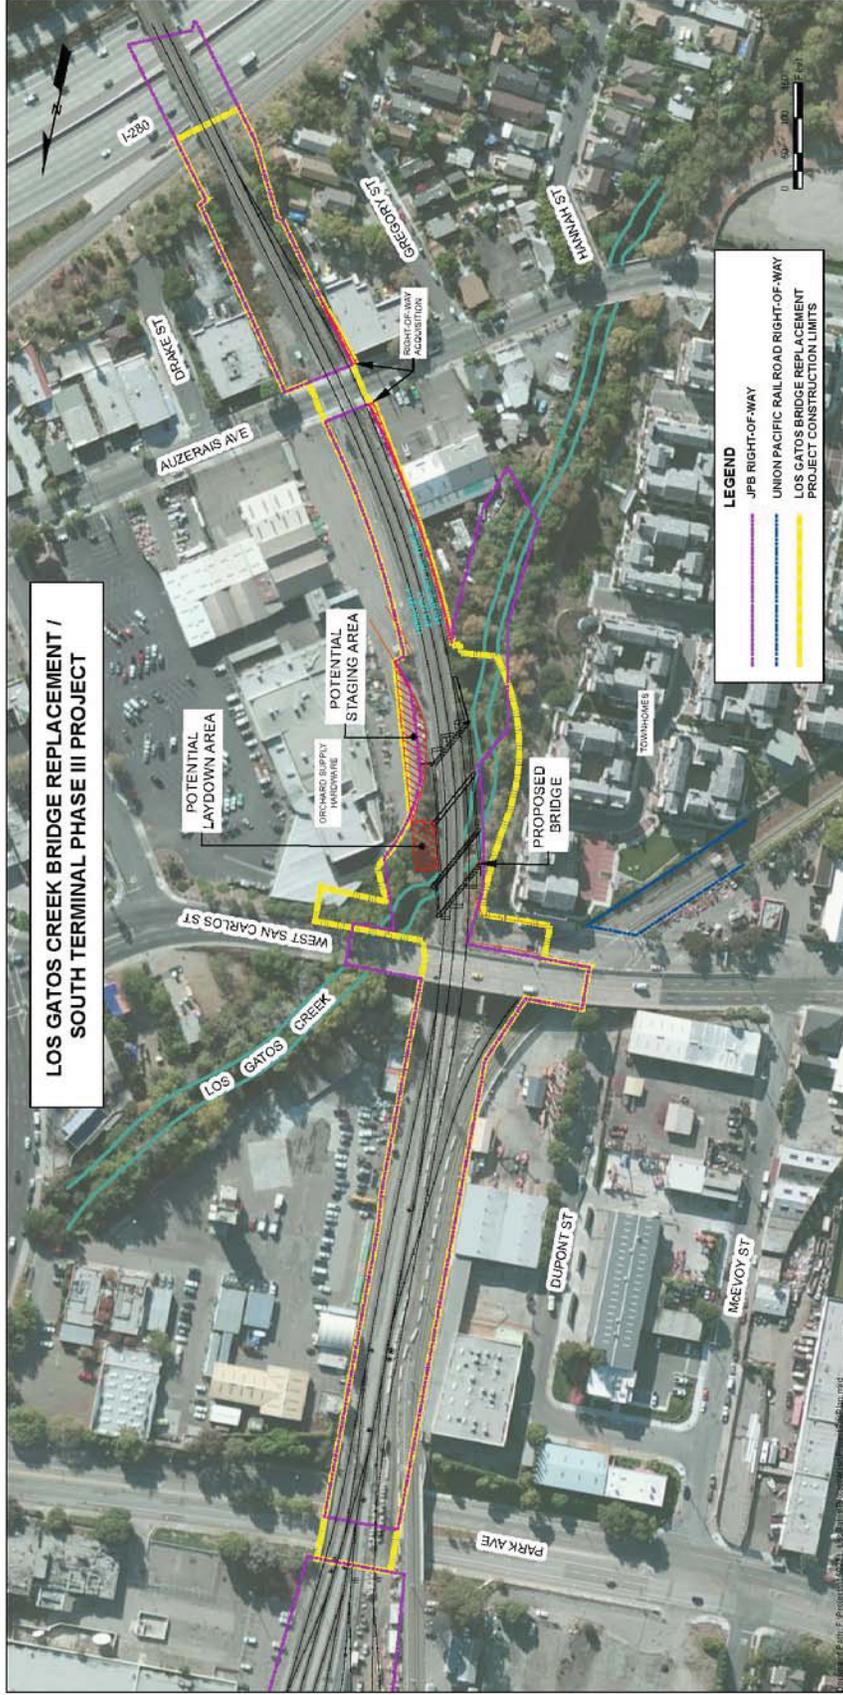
Los Gatos Creek Bridge Replacement / South Terminal Phase III Project Site Plan
